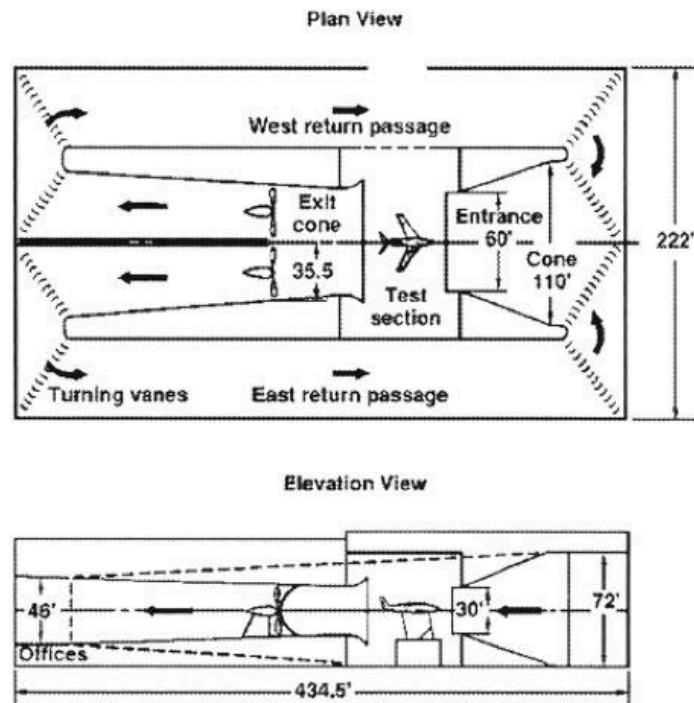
Cross-section of the Langley Full-Scale Tunnel showing the general layout and dimensions of the facility, <https://www.nasa.gov/centers/langley/news/factsheets/30X60.html>
